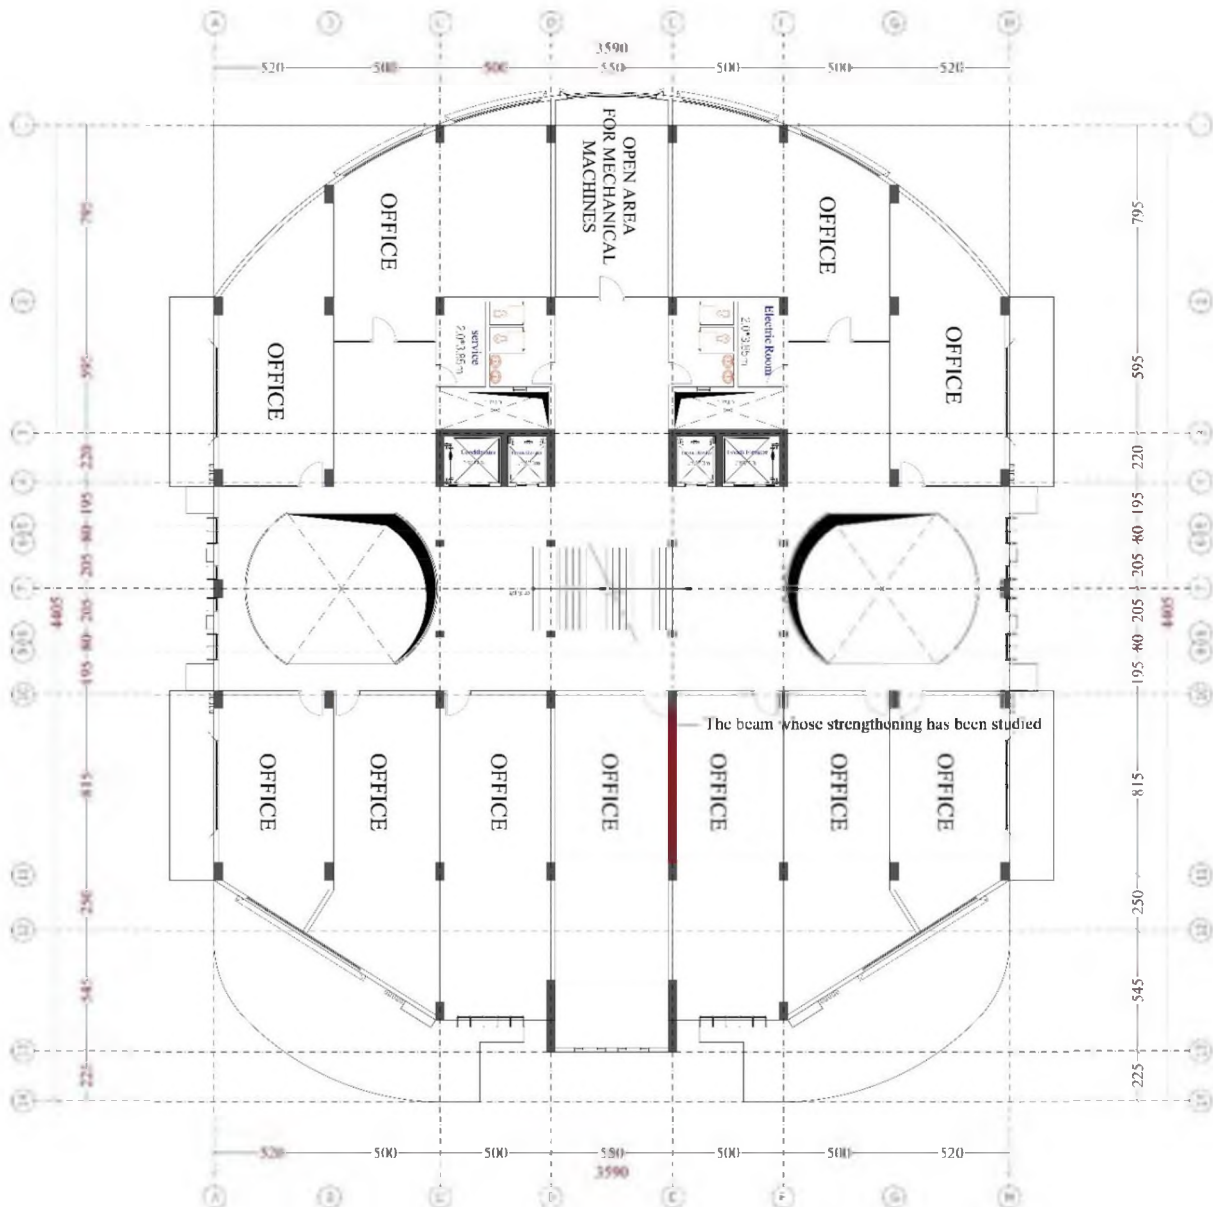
Plan for the sixth floor Indicates the location of the beam to be studied
